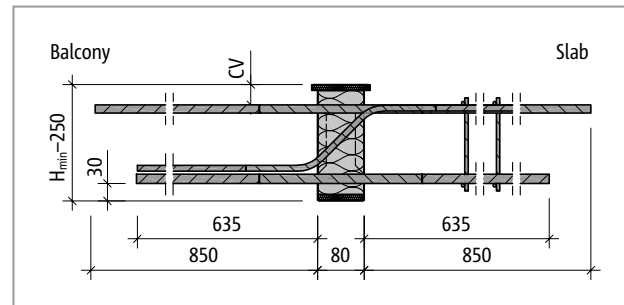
Schöck Isokorb® T type K-M13 to M14: Product section
